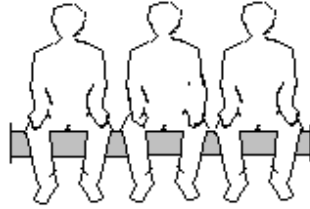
Side view of floor strip. Three humans sitting at floor midspan.
